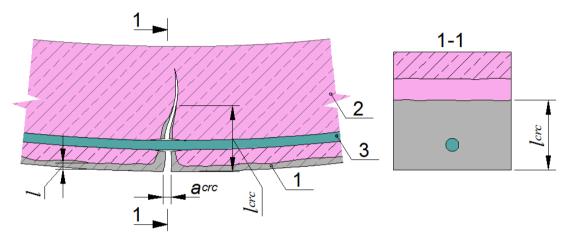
A bent reinforced concrete element with a crack: 1- carbonized layer; 2 - "healthy" concrete; 3 - reinforcement.
